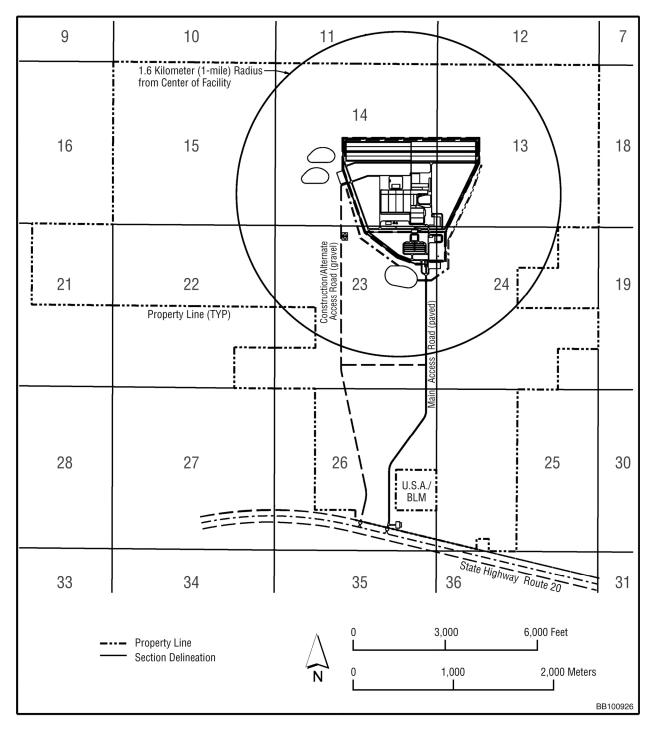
Proposed EREF Site Plan (AES, 2010a)
